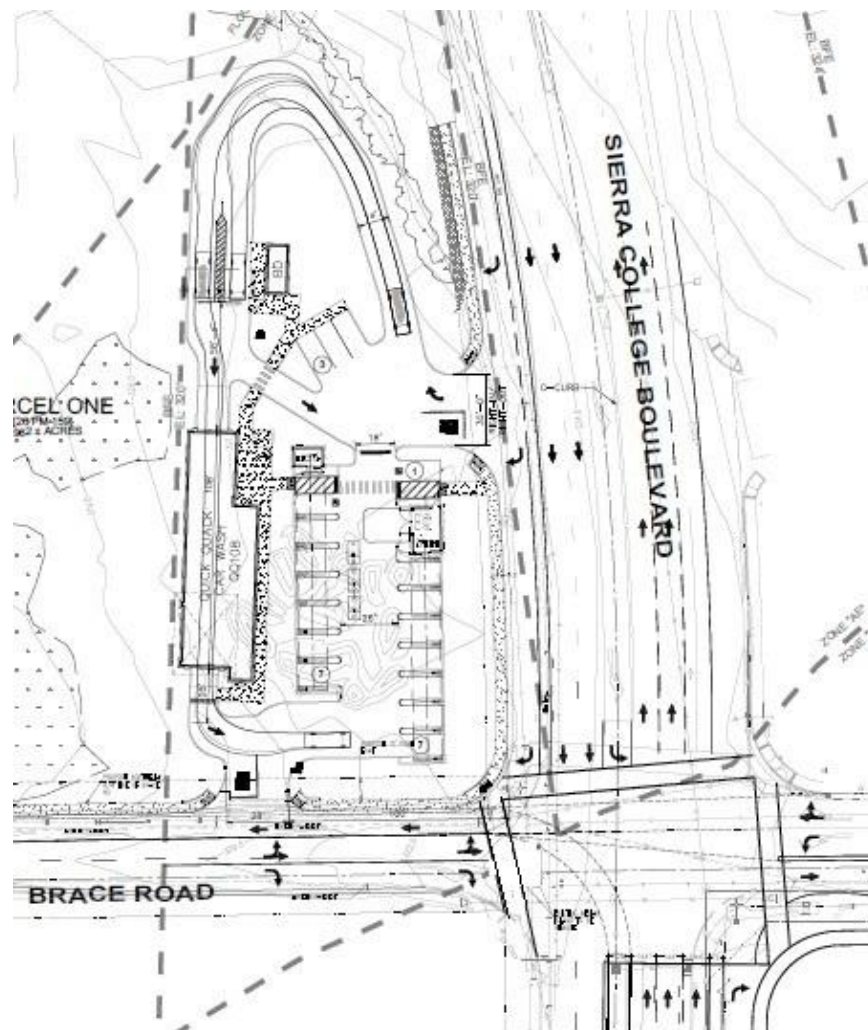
illustrates the project site plan showing the location of the proposed project driveways from the nearest intersection of Brace Road and Sierra College Boulevard.
